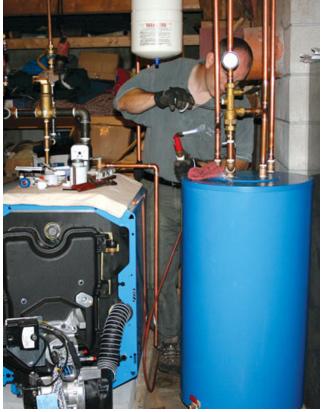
As part of the system upgrade, the author installed new circulator pumps and expansion tanks (left) and an indirect-fired domestic hot-water storage tank (above).
